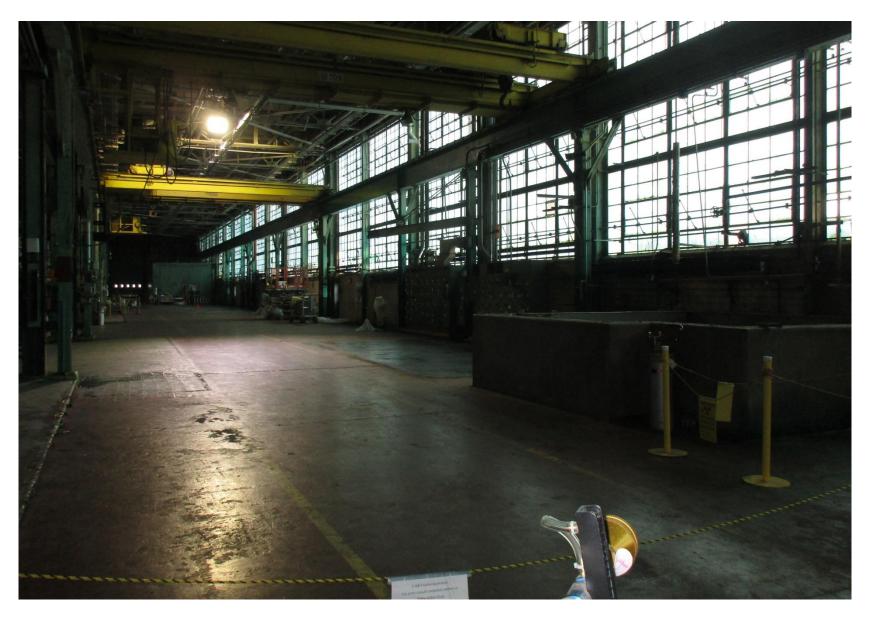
West Side Interior of the C-400 Cleaning Building Facing South (2017)
